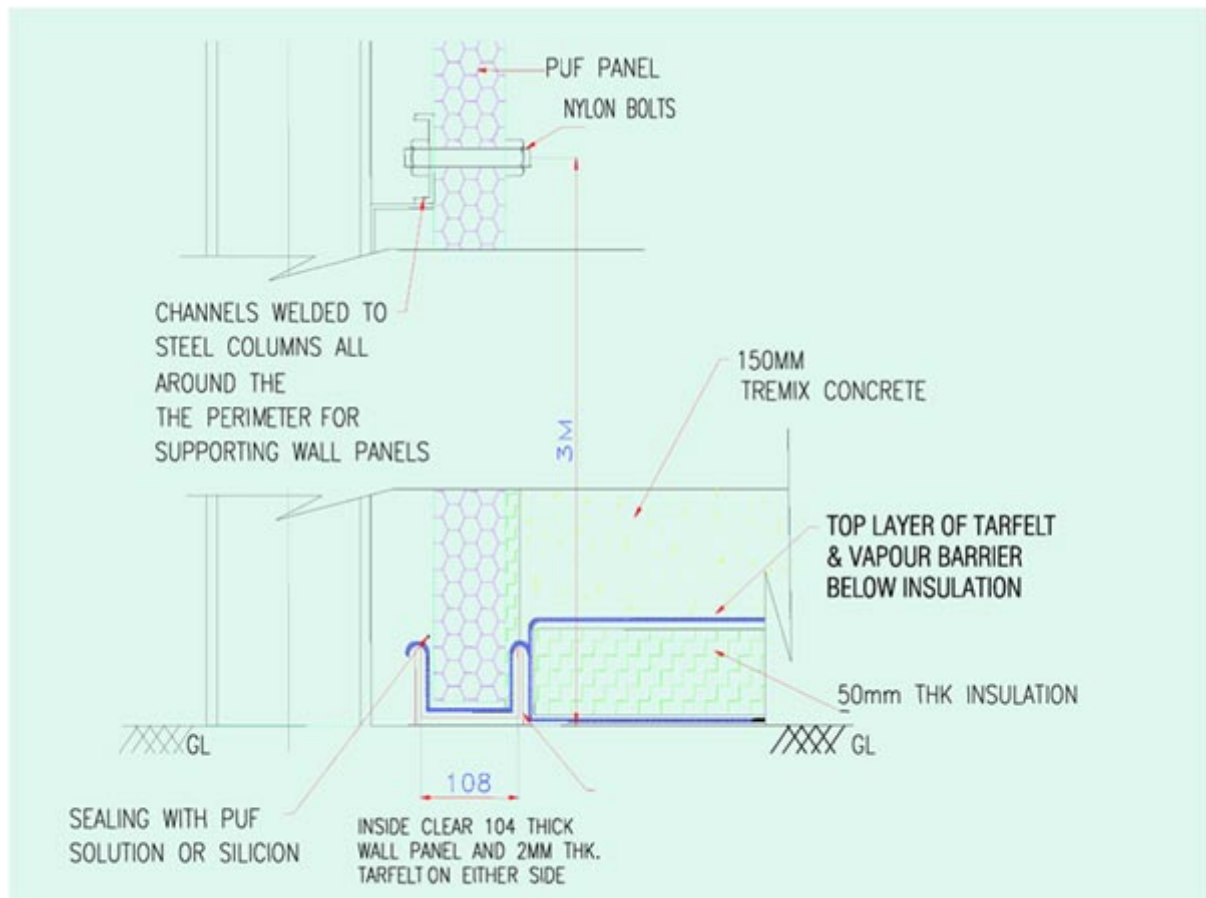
Section through floor insulation and wall panel supporting arrangement
